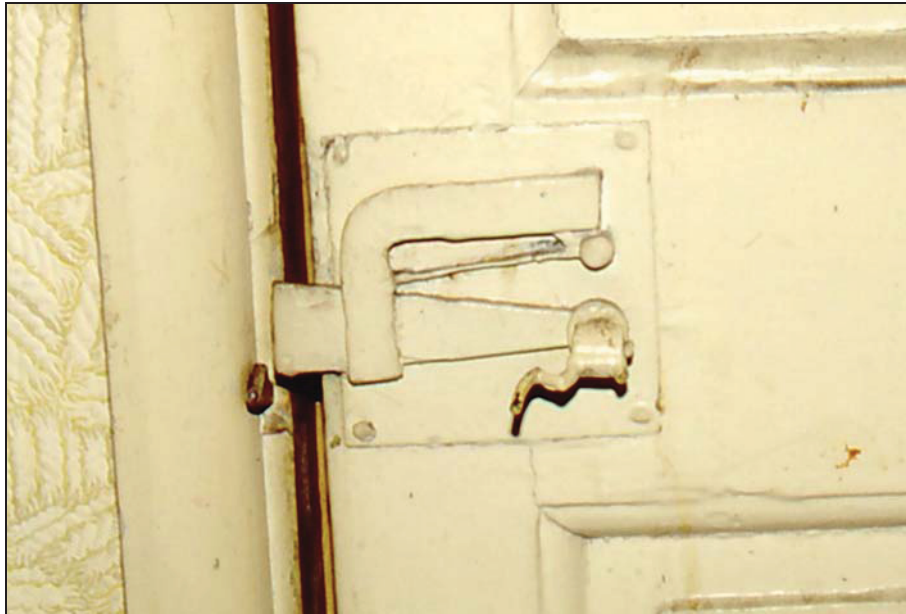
Detail of latch-handle to fitted cupboard, Room 6. Looking south.
